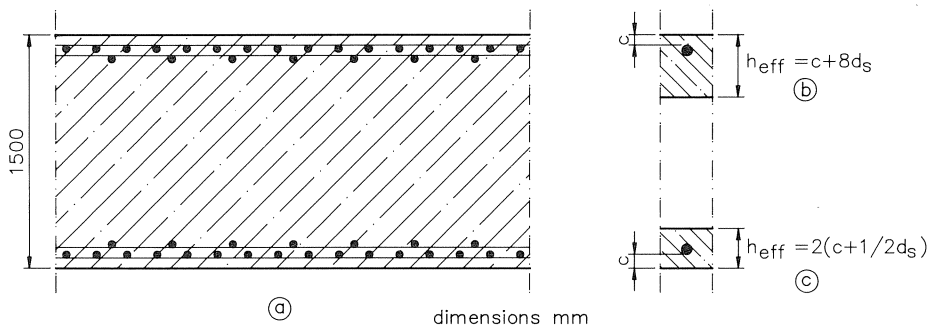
The crack pattern of a 1.5 m thick concrete wall (a) and the definitions of the “effective concrete area” according to Leonhardt [1985] (b) and Schiessl and Wölfel [1986] (c).
